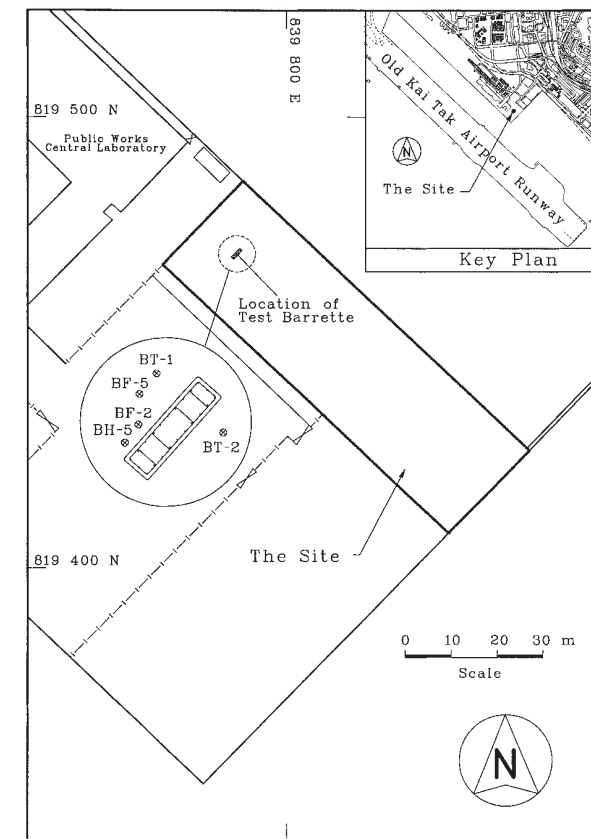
Location of Test Barrette at Kowloon Bay, Hong Kong
